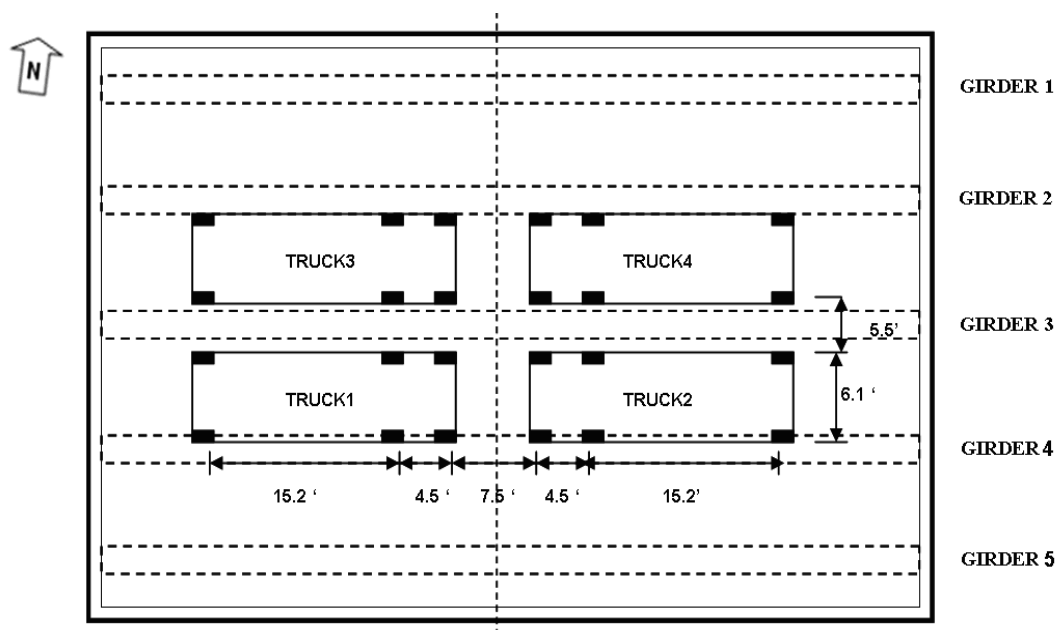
Placement of Trucks for Paulding County Bridge Load Test
